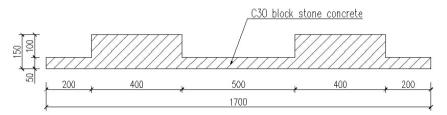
Cross-section of main arch ring, Guanyin Bridge.
